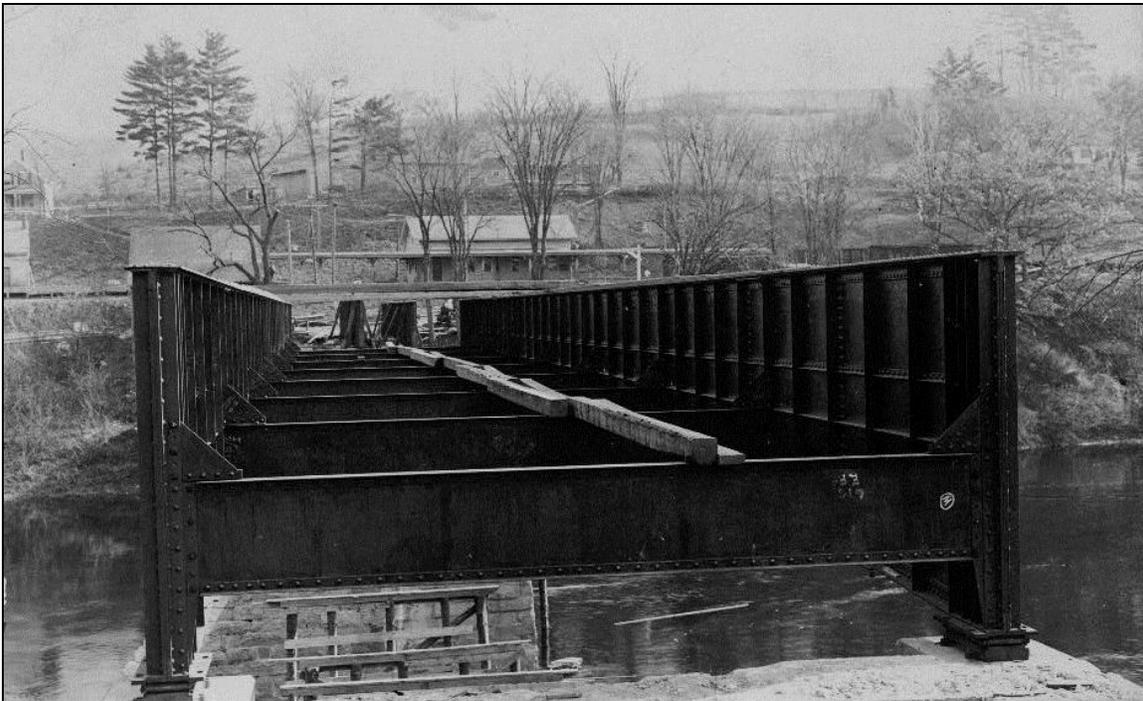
Walpole Village Bridge (steel girder), under construction, ca. November 1910; note the buildings visible in the distance on the Walpole bank, including the railroad station, at center, general store, at left, and former toll house, far left, all no longer standing (HAER 1988).
